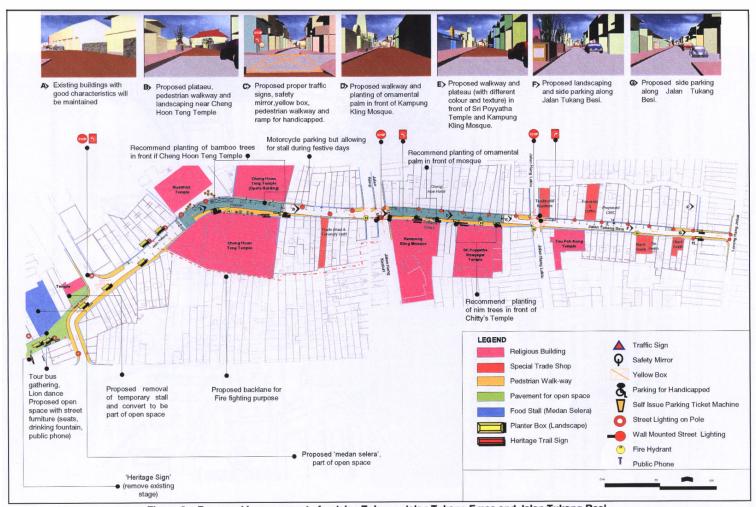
Proposed Improvements for Jalan Tokong, Jalan Tukang Emas and Jalan Tukang Besi
